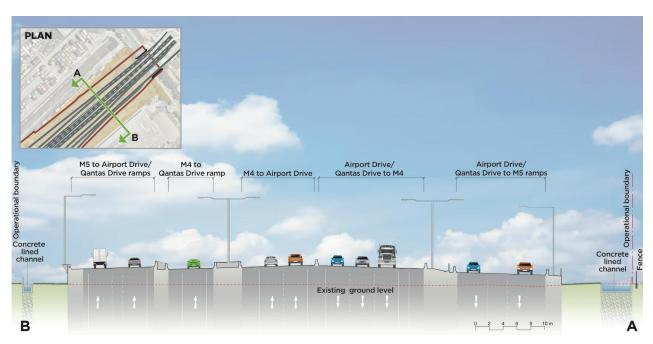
St Peters interchange connection south of Canal Road - typical cross-section (looking south)
